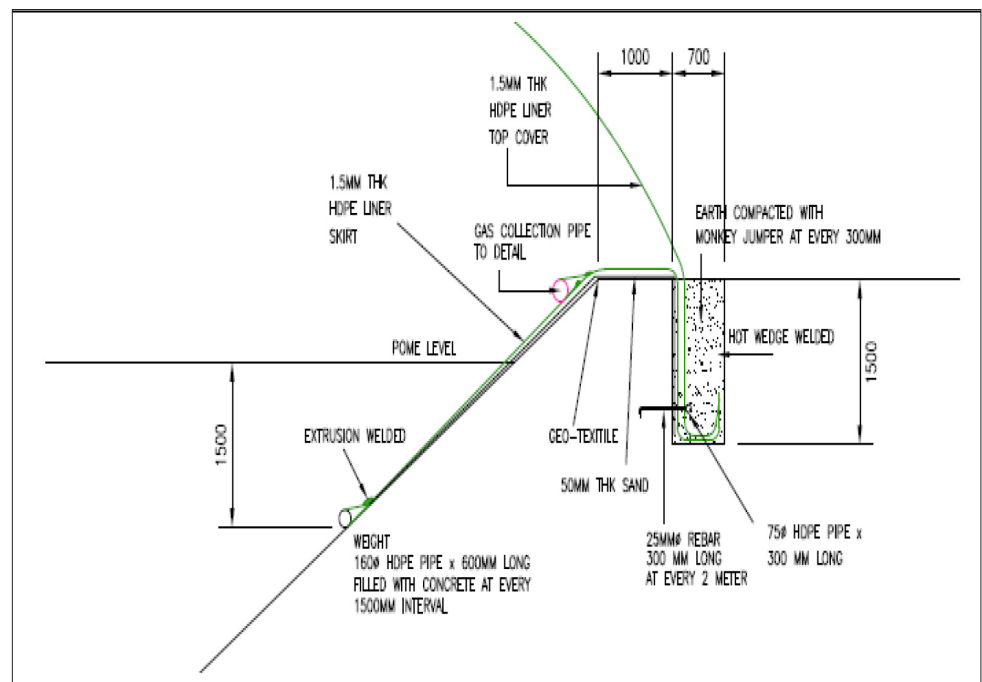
Detail of Typical HDPE Skirt and Top Cover Installation (Source: FGV)
